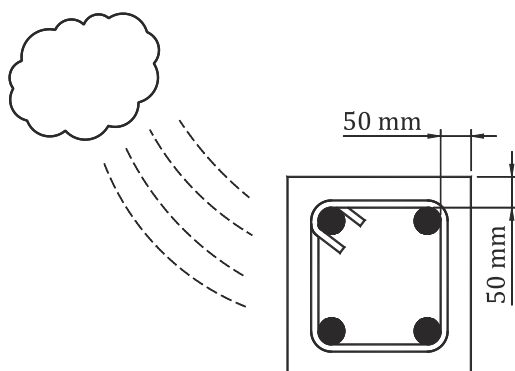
All types of reinforcement of elements exposed to weather (Minimum concrete cover: 50 mm)
